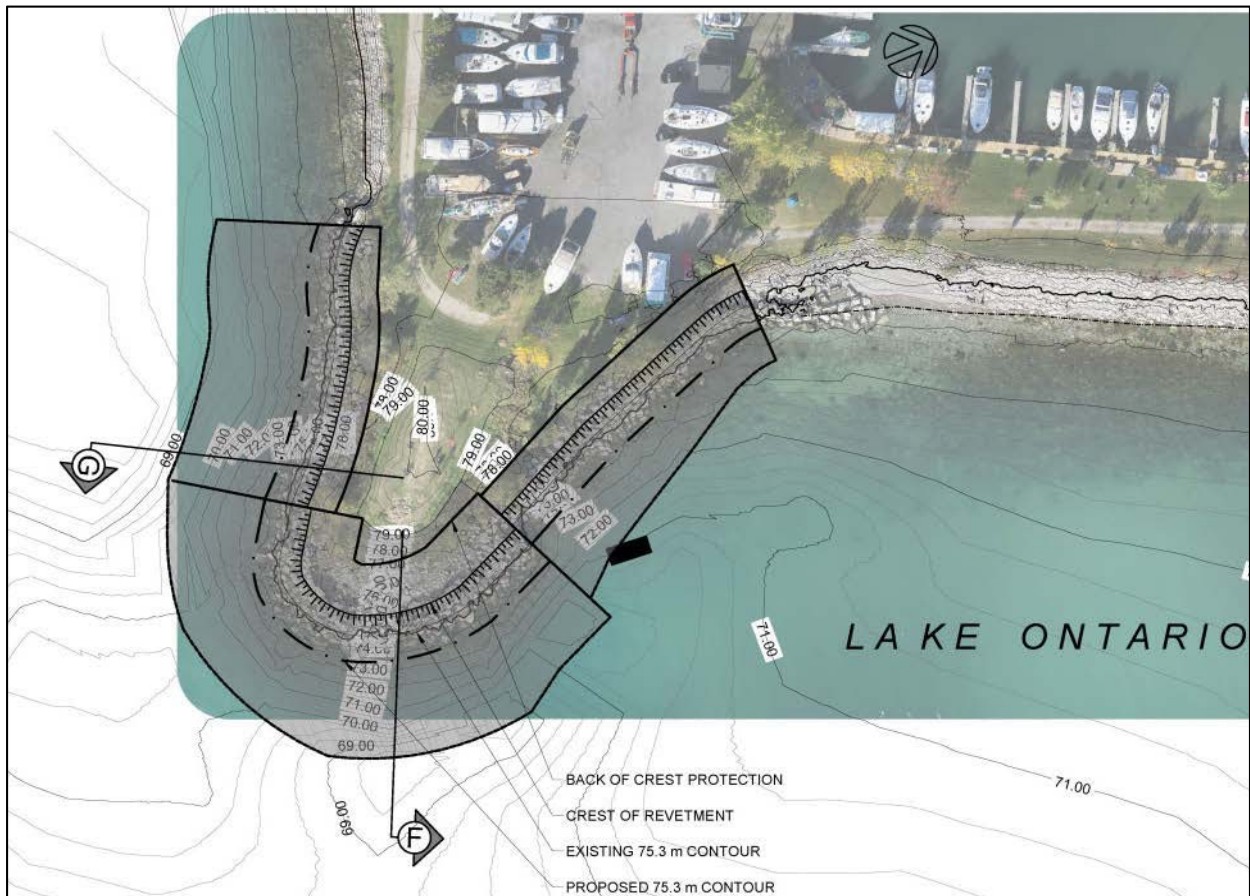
Concept design plan view for Option 1C - repair headland. *Source: Shoreplan Engineering, 2017.
